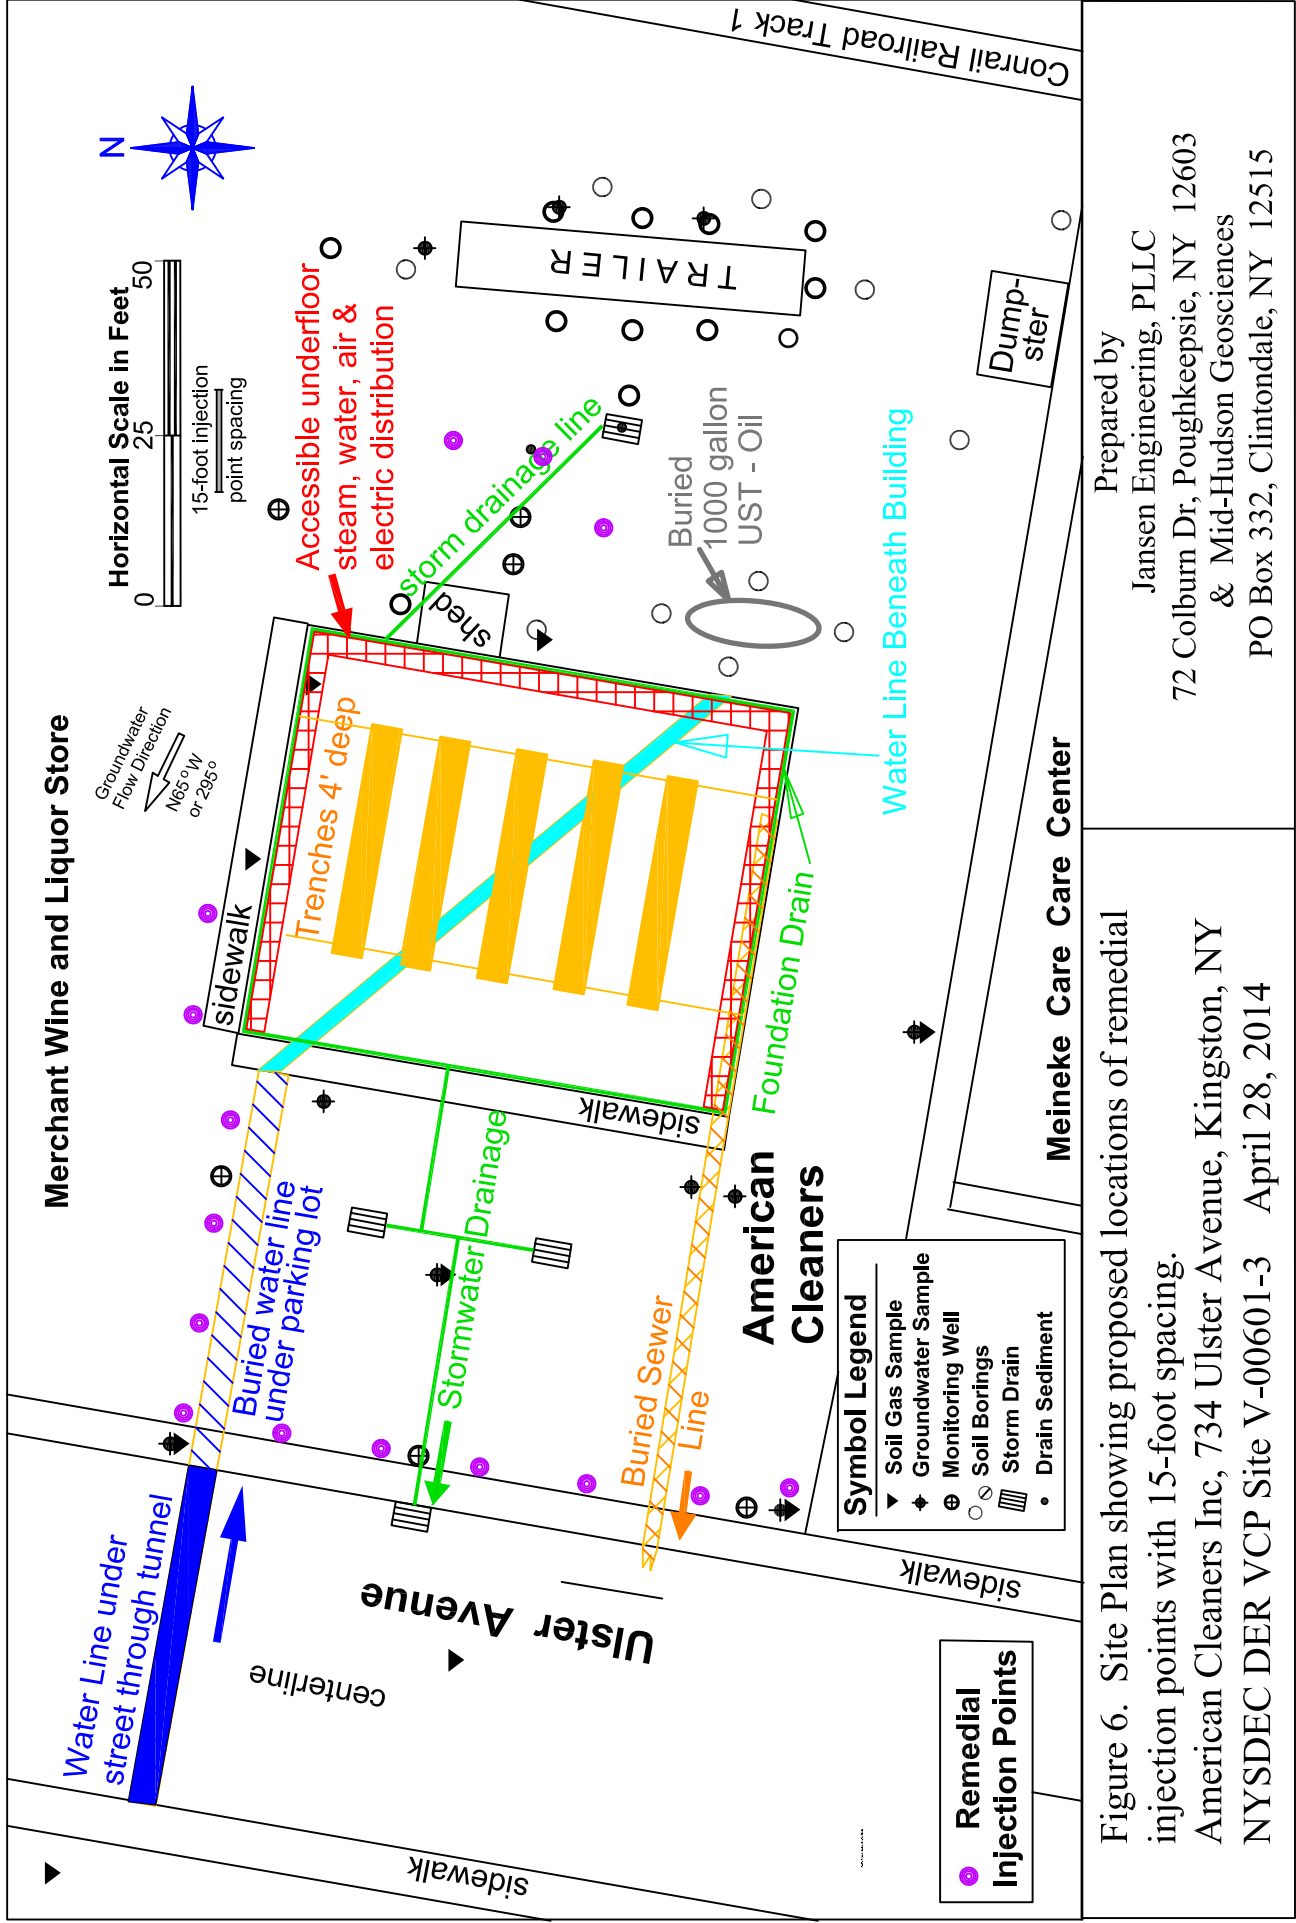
Site Plan showing proposed locations of remedial injection points with 15-foot spacing.
